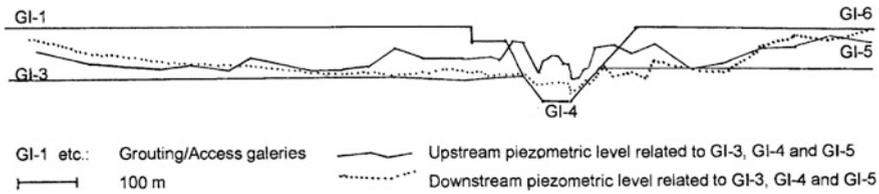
Pueblo Viejo Dam. Section along grouting galleries/tunnel showing piezometric levels related to fully impounded reservoir on upstream and downstream side of the curtain and changes between November 1983 and December 1985
